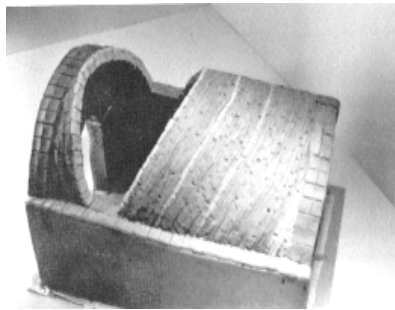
A vault structure made of clay bricks (Source: Khalili, 2000)
